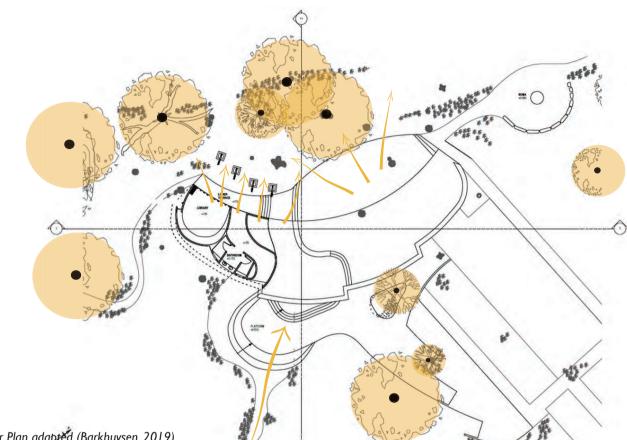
Sandibe Floor Plan adapted (Barkhuysen, 2019).
